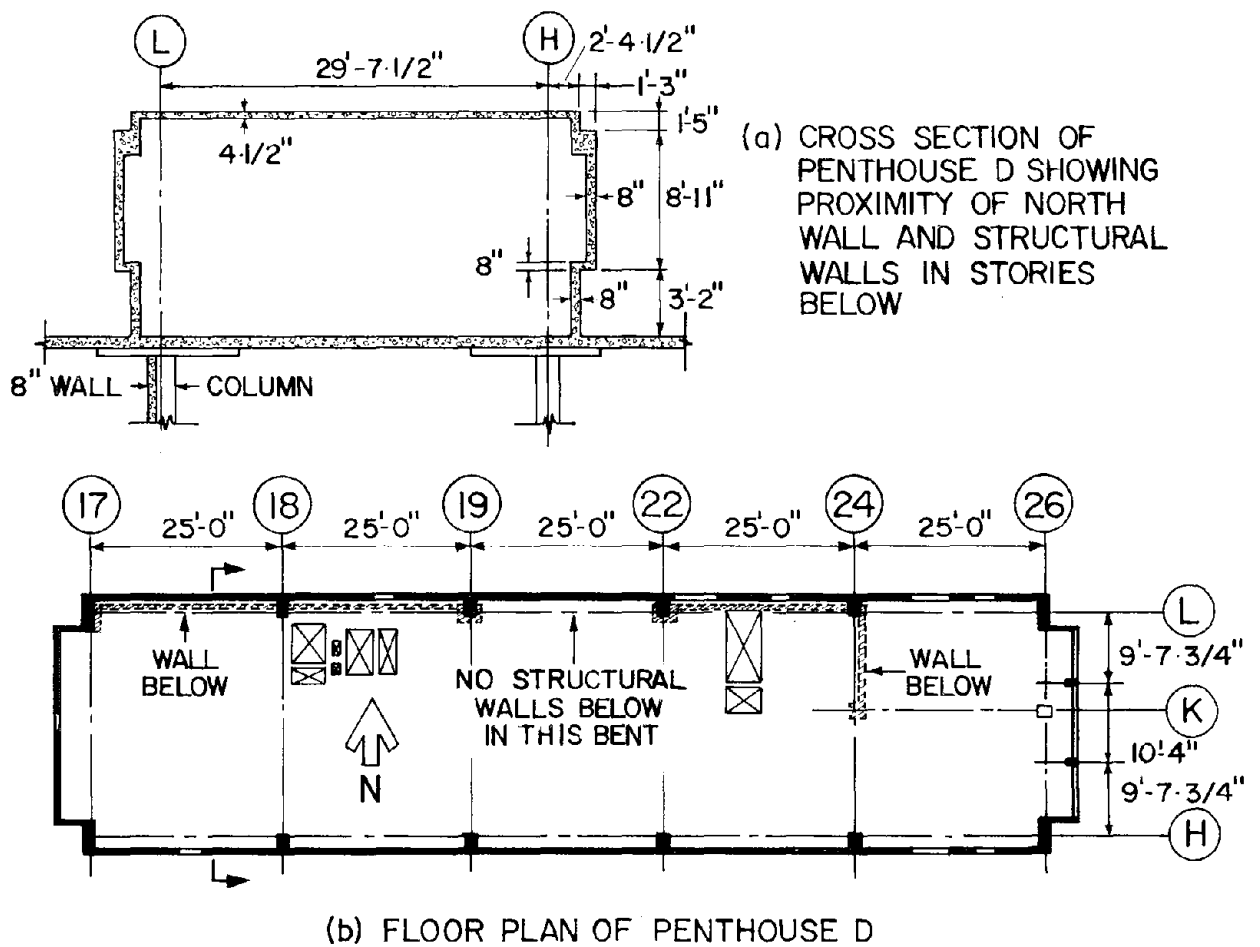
DETAILS OF UNIT D PENTHOUSE
